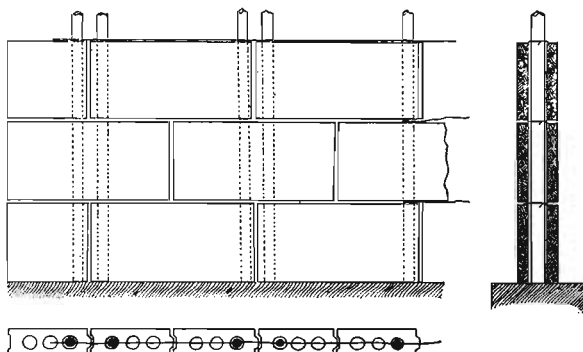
Gypsum boards fastened together with cement or gypsum rods.
